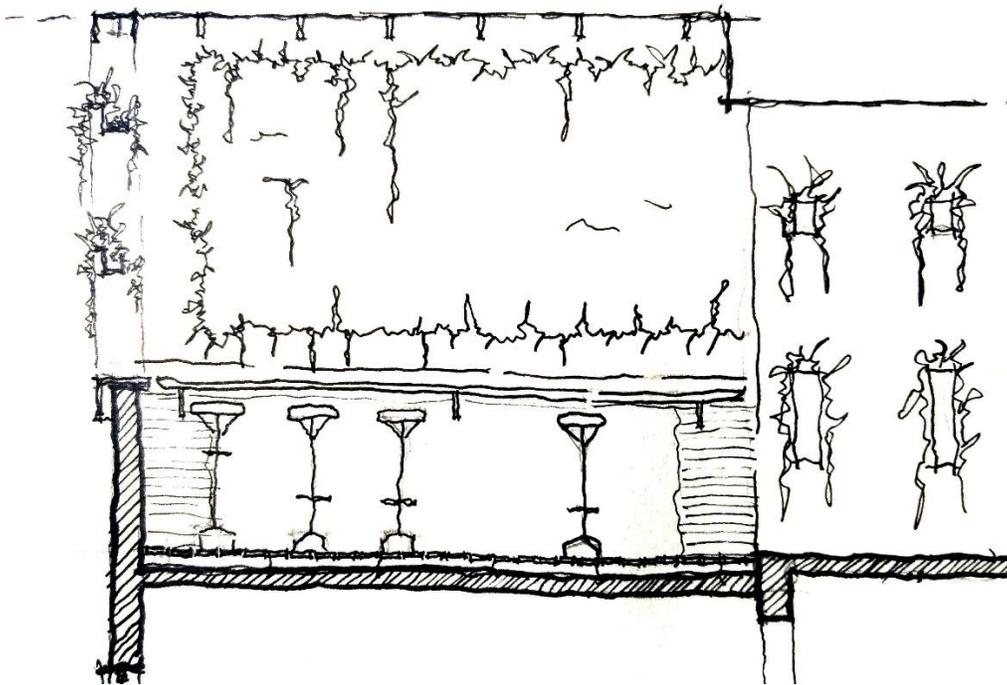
illustrating a sketch of a typical section through the Living Room Restaurant (Source: Author)
